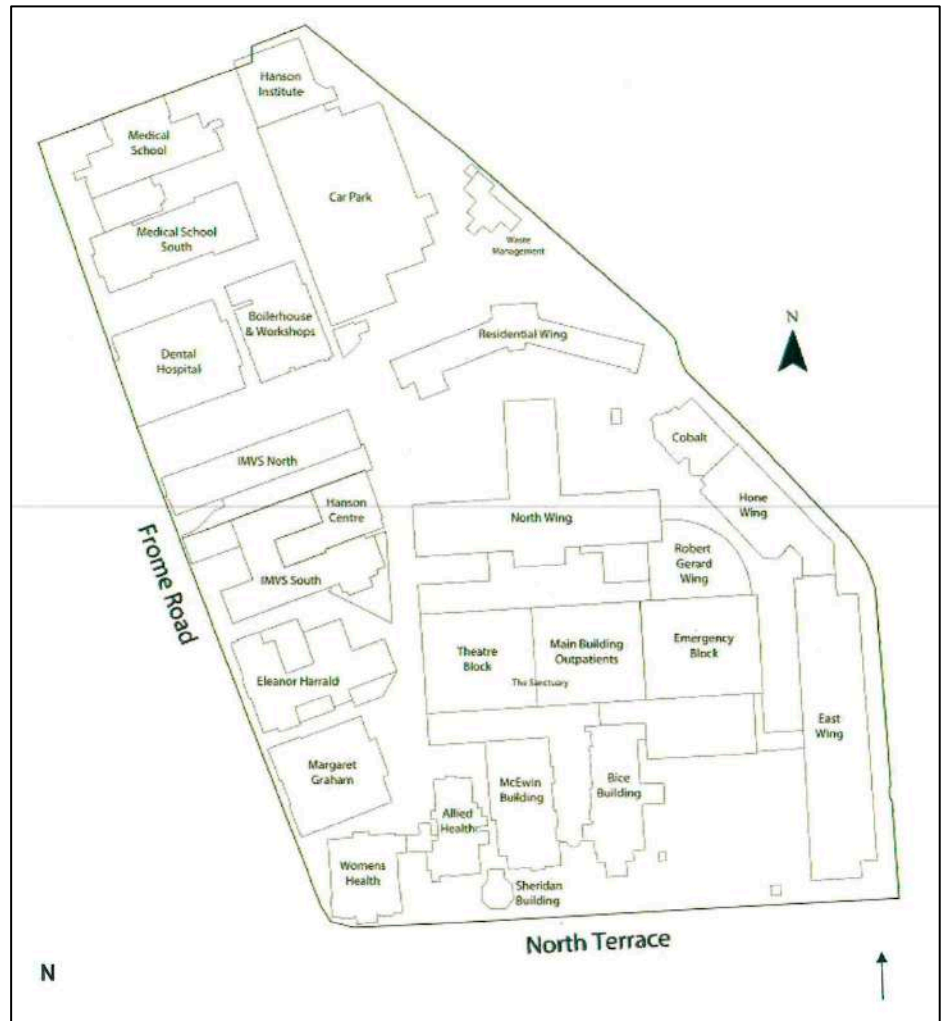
RAH site plan, 2014 [Source: McDougall and Vines 2014:2]
